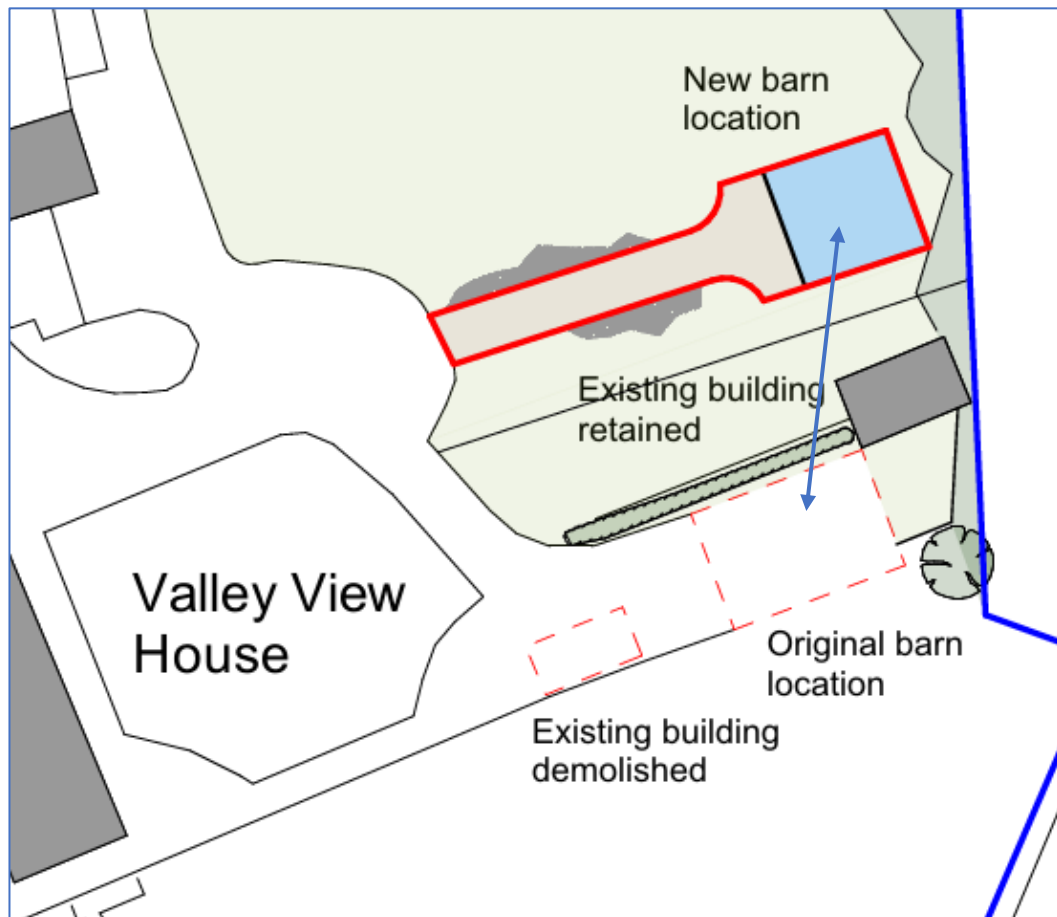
Proposed Site Layout (extracted from submitted plans)
